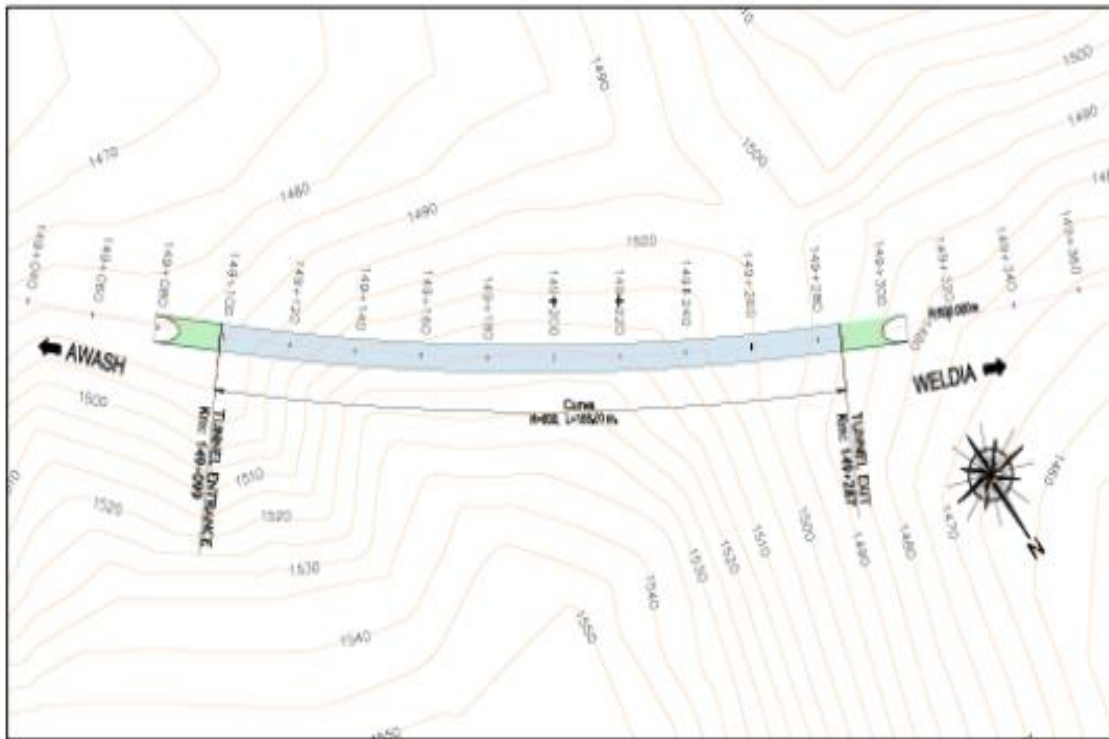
Layout of Tunnel T-02 (source: ERC and AWH railway project office)
